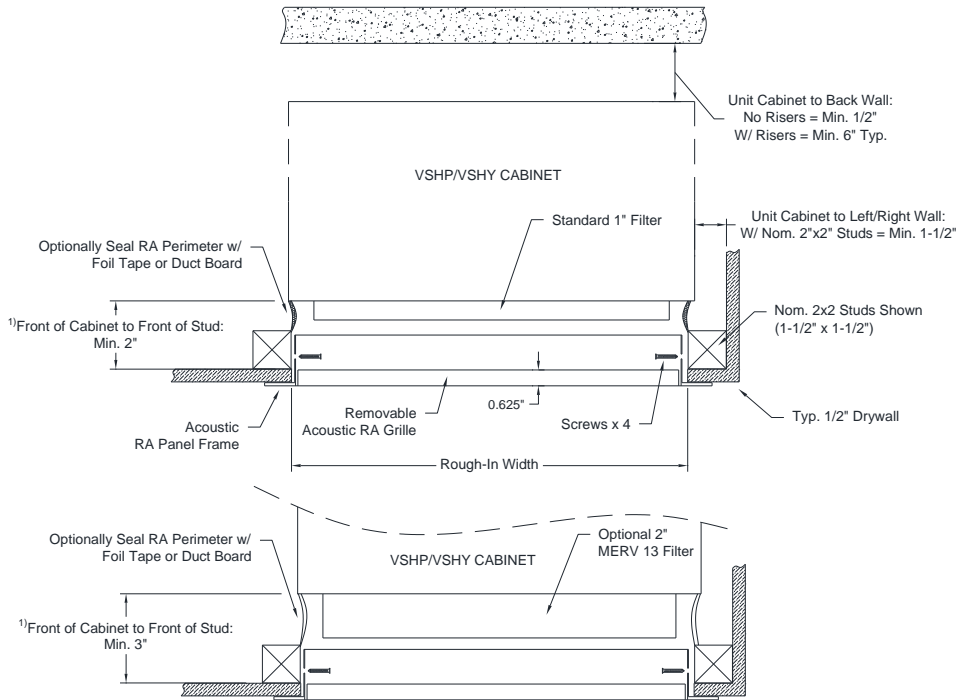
Acoustic Panel Furring Detail—Typ. 2x2 Framing Plan View
